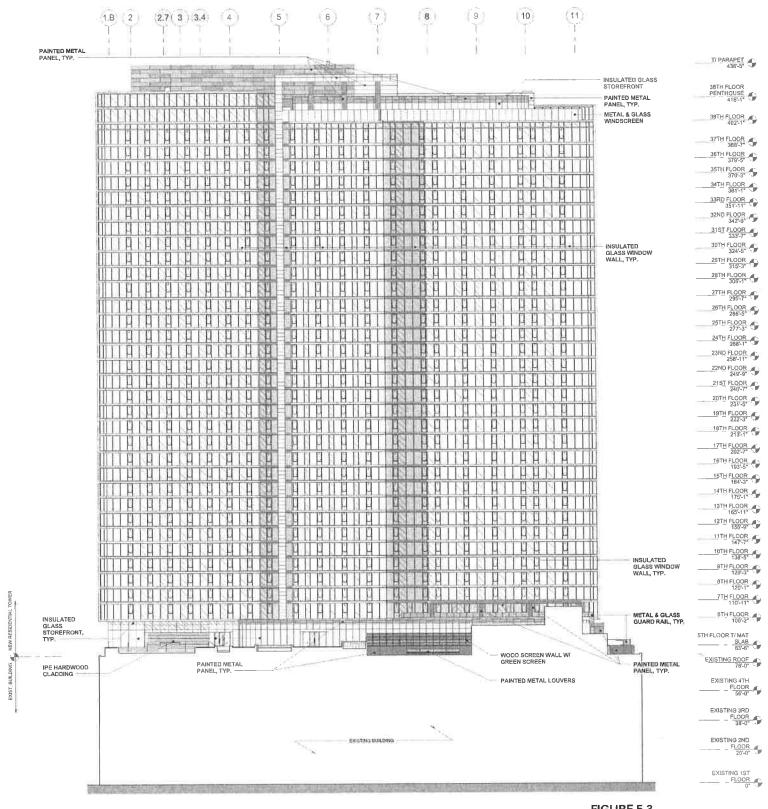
PROPOSED SOUTH ELEVATION
